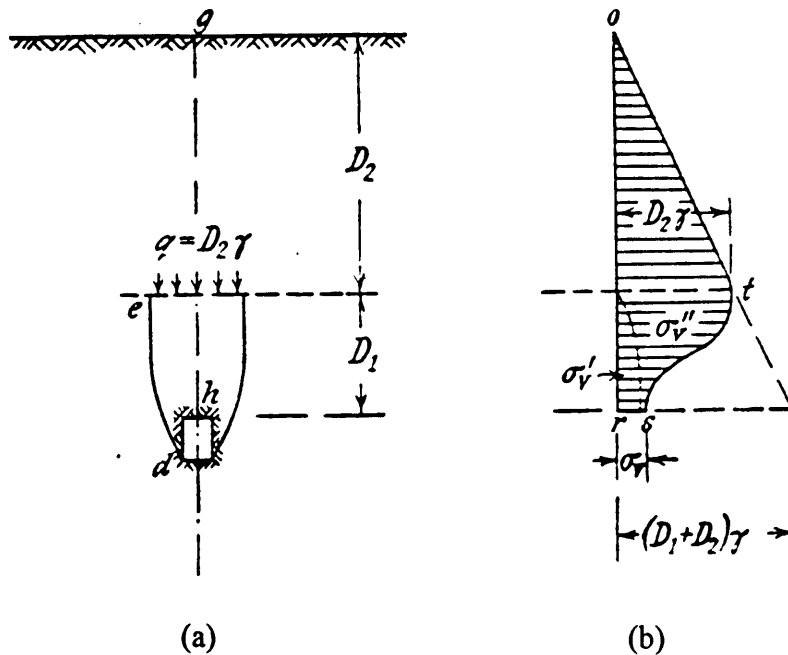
(a) Yielding Zone in Soil When Tunnel Located at Great Depth, (b) Vertical Stress Profile in Soil Located above the Tunnel (Terzaghi, 1943)
